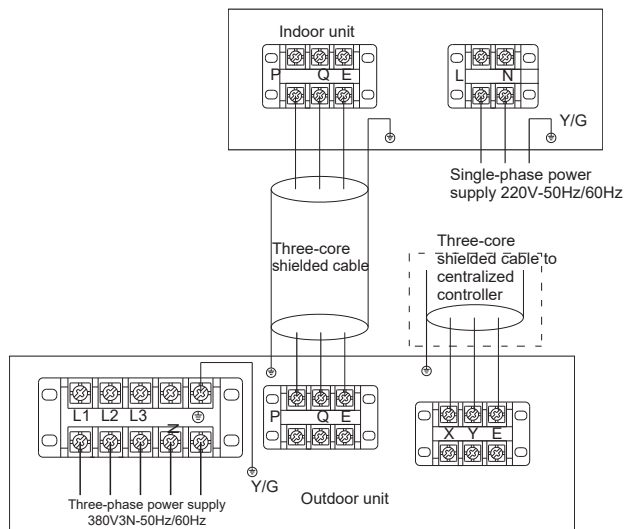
Electrical Wiring of Three-phase Outdoor Units
